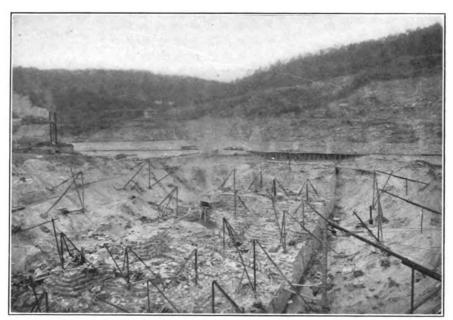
Fig. A.—New Croton dam, showing arrangement of derricks. Note at far end the masonry wall between the temporary diversion channel and the pit.
